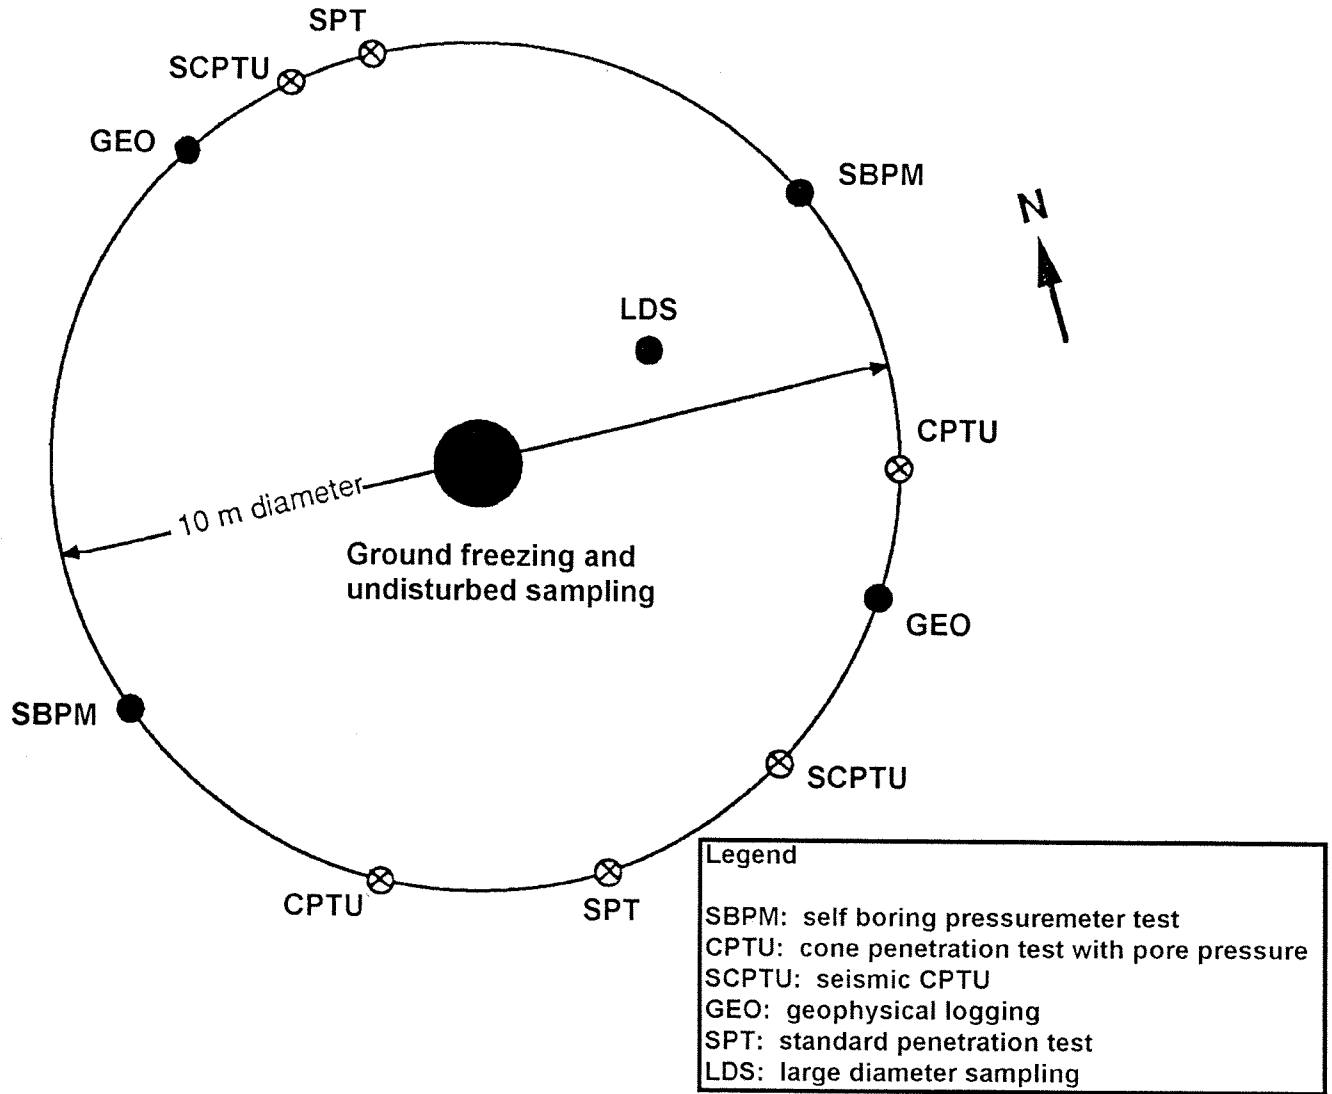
Typical layout of the detailed site characterization at each of the six CANLEX sites (detailed site plan of the in-situ testing area at the LL Dam site; after Biggar and Robertson, 1996).
